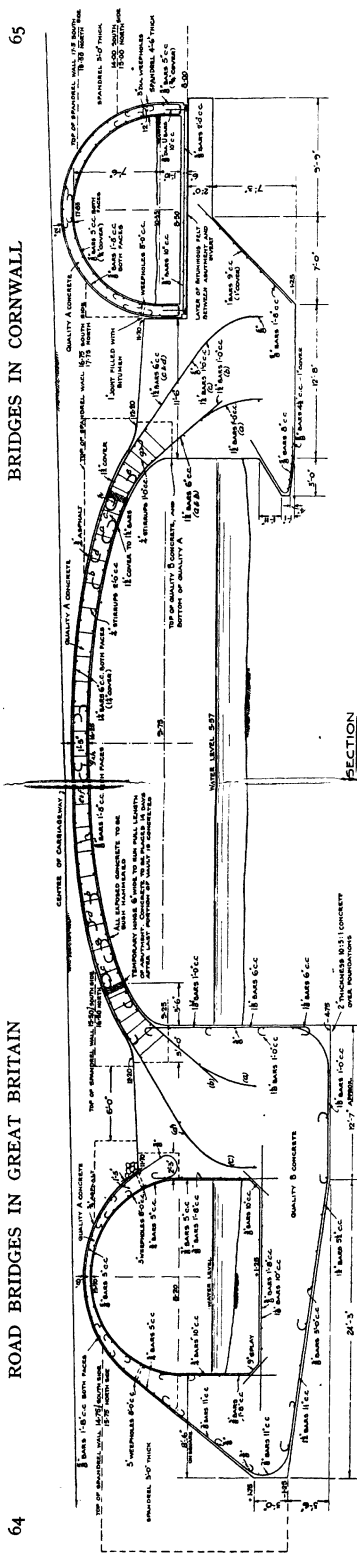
River Bridge, Lostwithiel, Cornwall.
